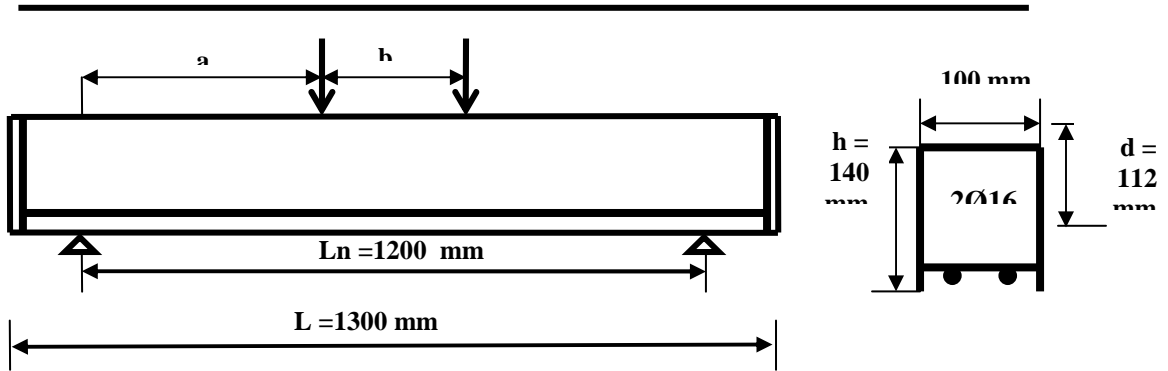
Dimensions and reinforcement details of Ridha's RPC beams ⁽¹⁴⁾
